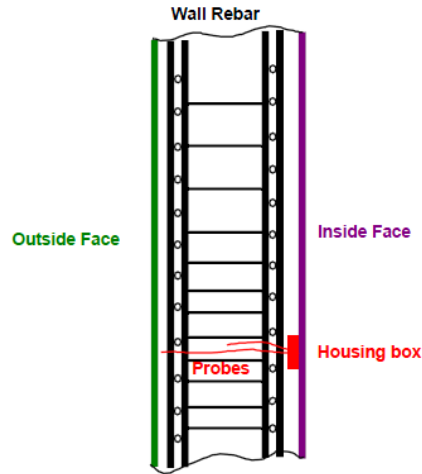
Typical temperature sensor installation for wall (adopted from CH2M)
